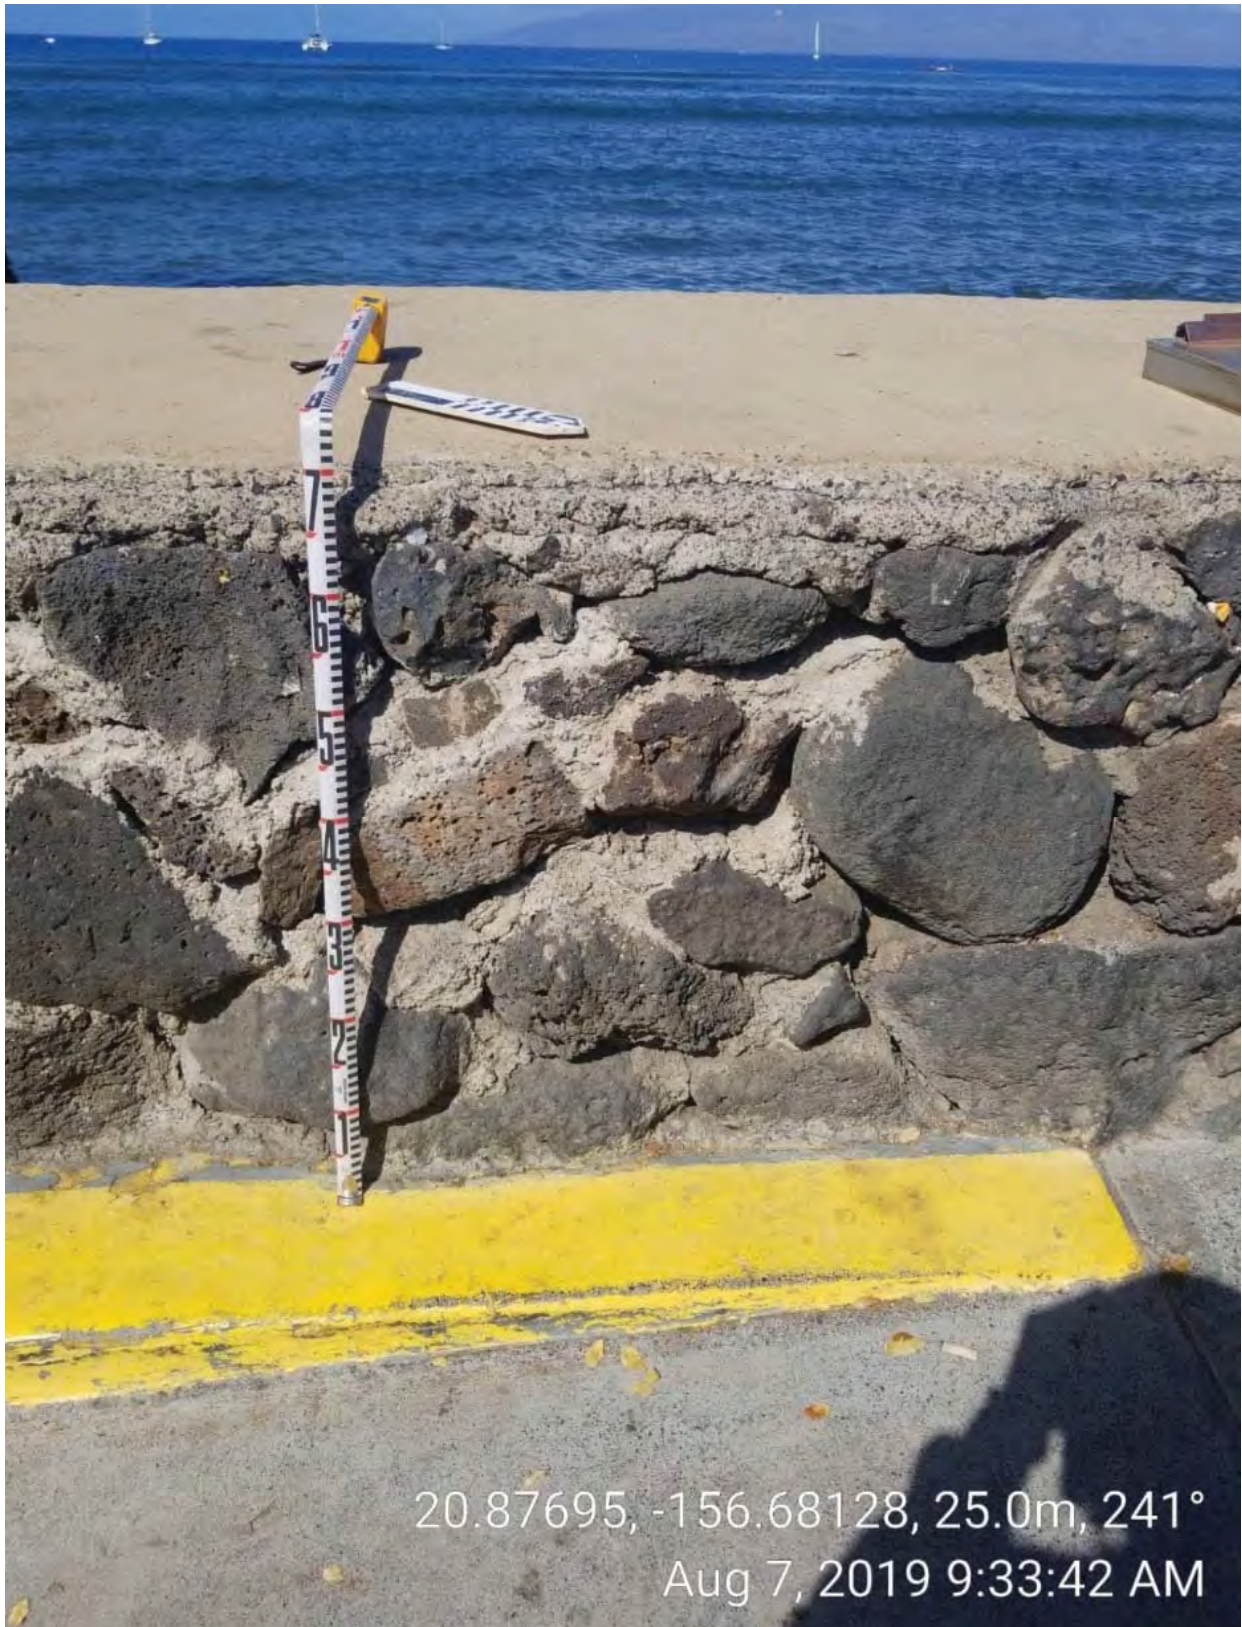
Photographic View of Area 2 Wall Profile Adjacent to the Sidewalk in Area 2 Showing Previous Repairs. View to Southwest.
